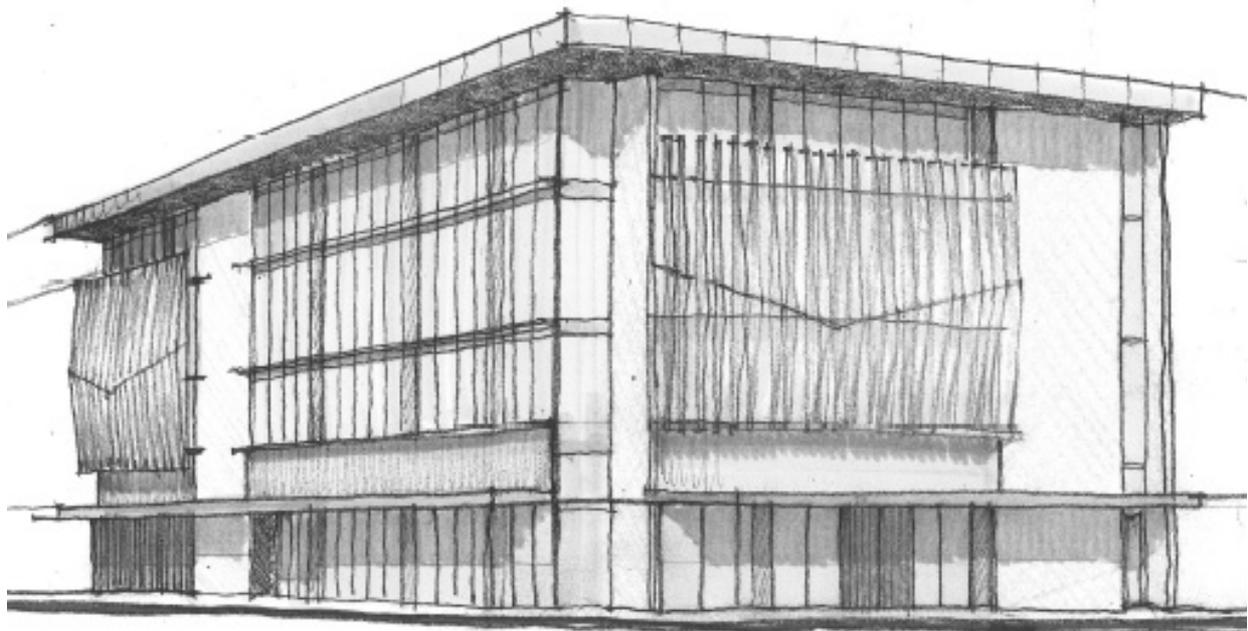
Architect's concept sketch of the proposed building at 190 Hereford Street, Christchurch. Design by Irving Smith Jack Architects, Nelson.
